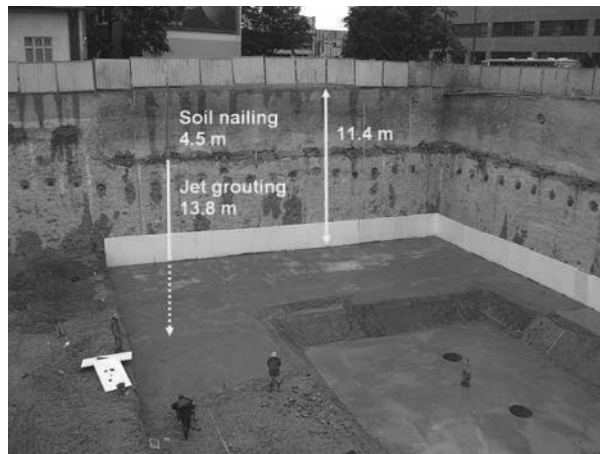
View into the excavation. Retaining structure made by soil nailing and jet grouting.
